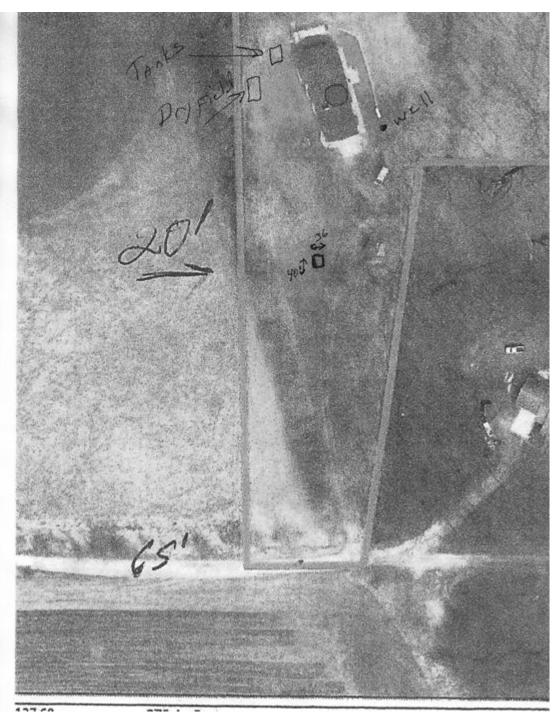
Site Plan showing Septic tanks, drainfield, and well locations.
